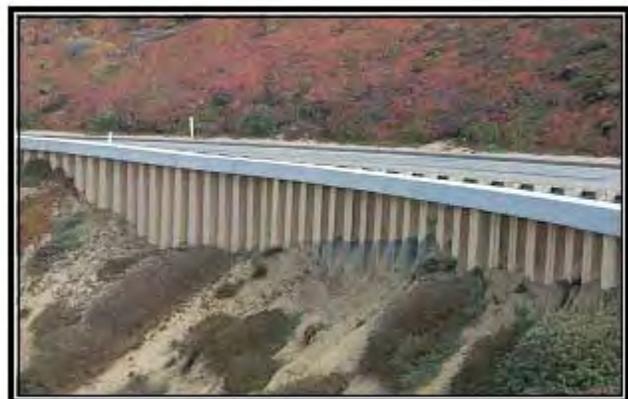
A sheet pile retaining wall was constructed near the El Sur Ranch (MON-1-55.1) to stabilize the roadbed from movement undercutting
